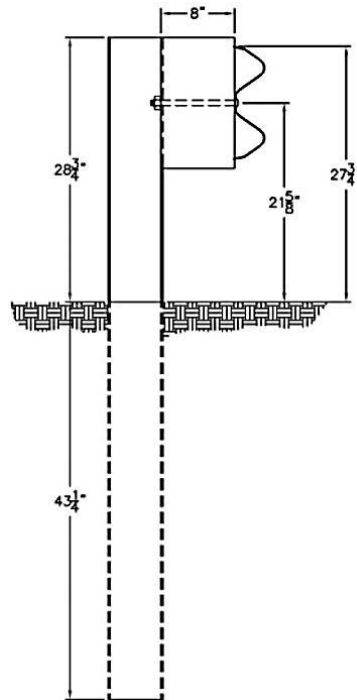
Typical Cross-Section of Modified G4(1S) Guardrail
